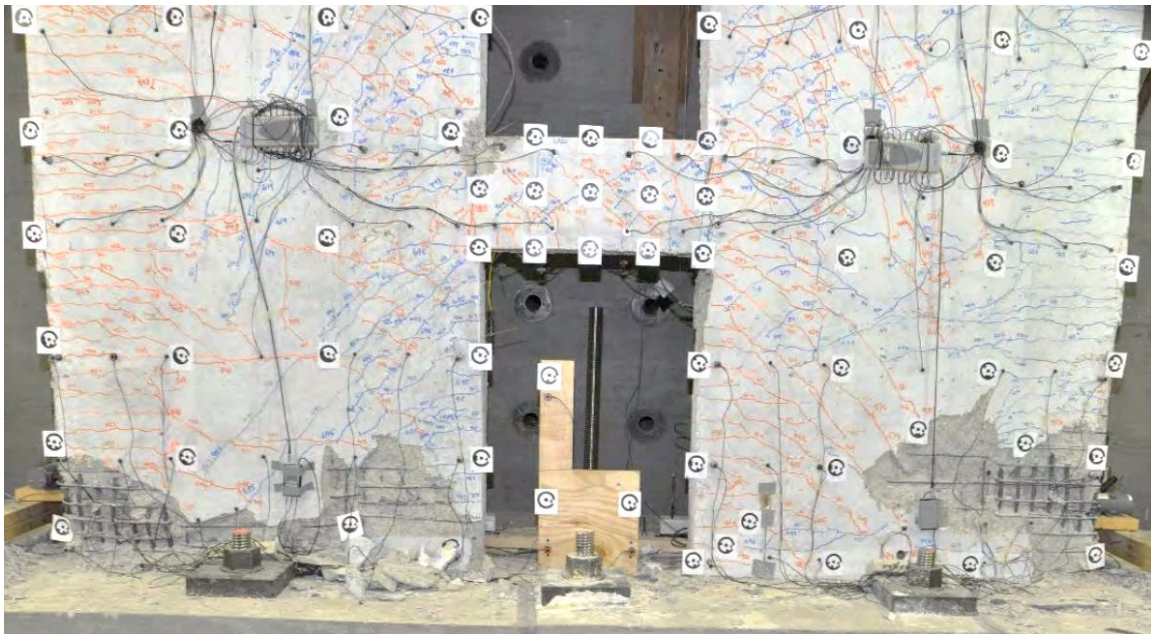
Coupling wall boundary element detail (Turgeon 2011)
